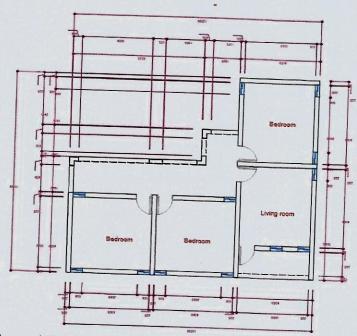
Floor plan of Dei-Dei Resettlement scheme Source: Author's field work, 2011
